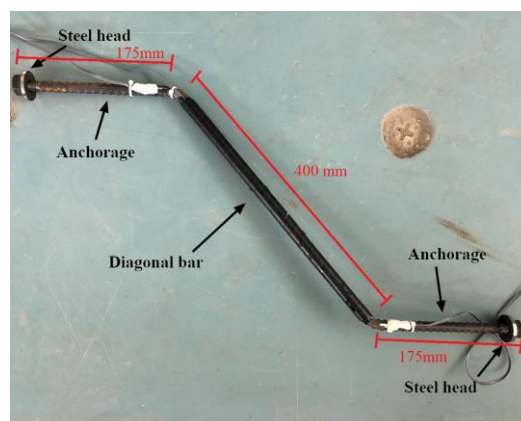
Single headed diagonal bar used in the proposed reinforcement
